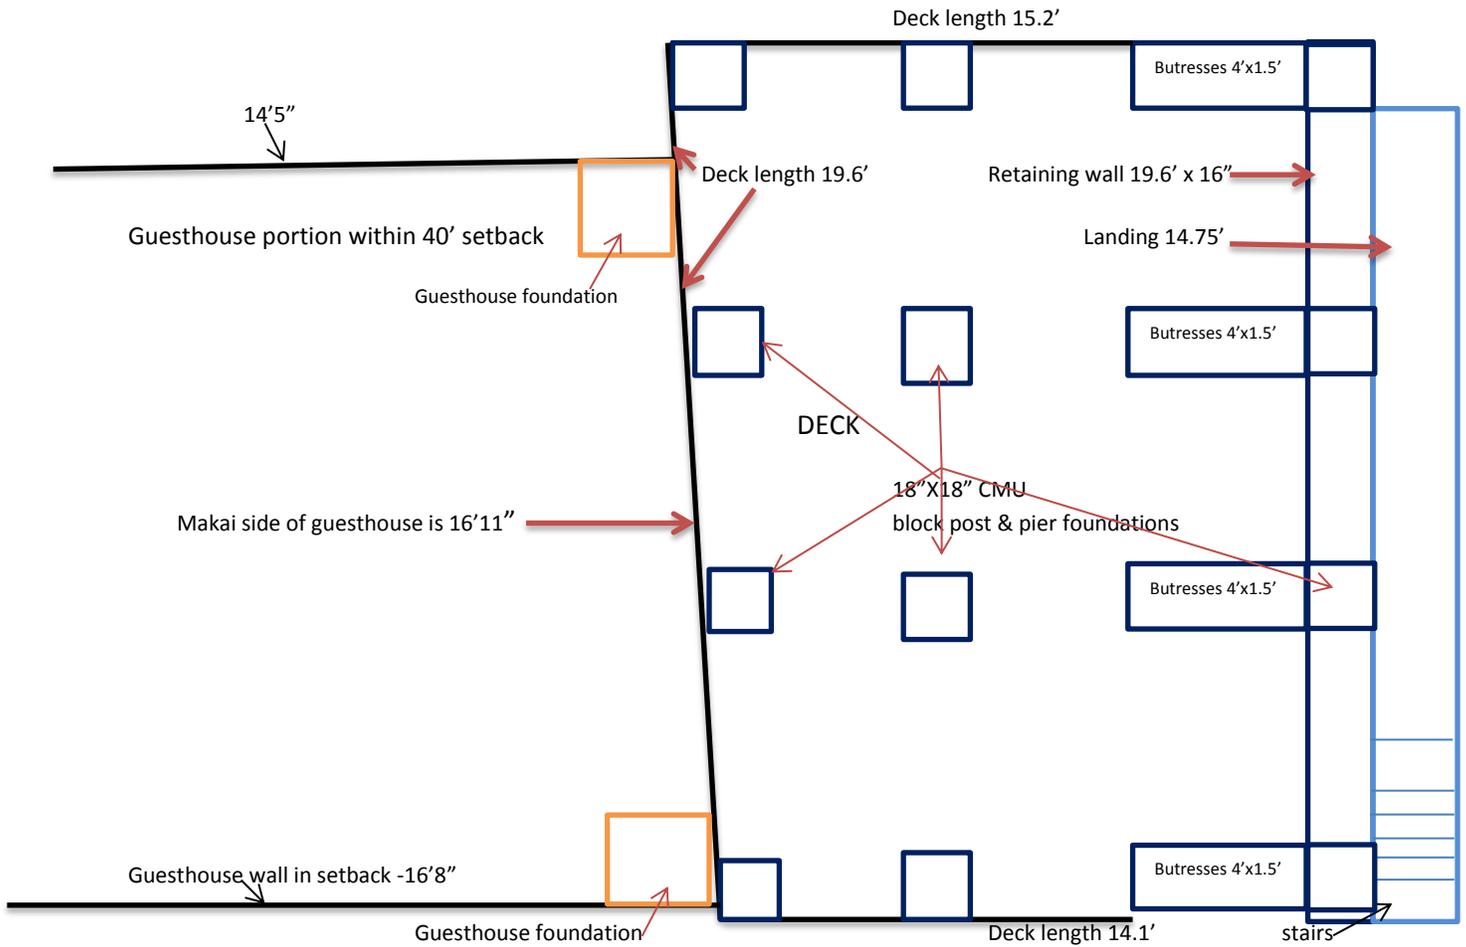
A: Cross Section Schematic of Retaining Wall with Post and Pier Foundation and Buttresses
